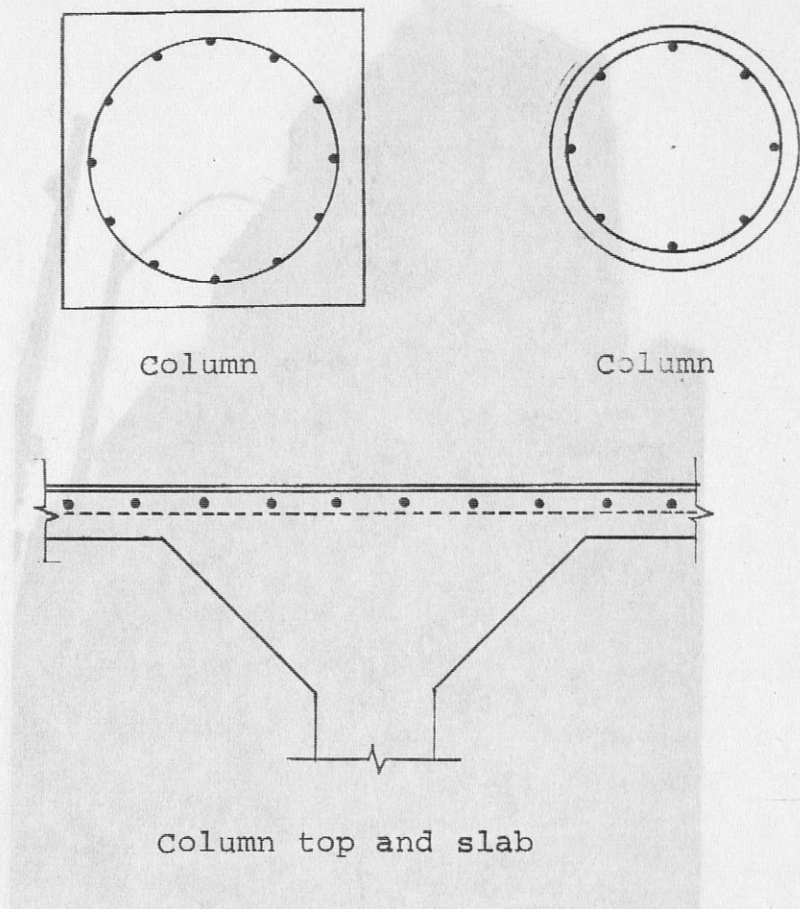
Typical Cross Sections of Floor Slabs and Columns in Building J
